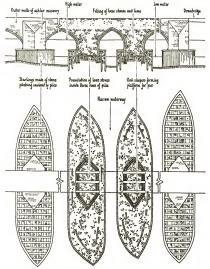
Old London Bridge, after drawings made during its demolition, 1826-31. (Above) Elevation; (below) plan of the starlings.
